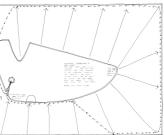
& 26. Technical drawing for House of the Future including detailing roof drainage
